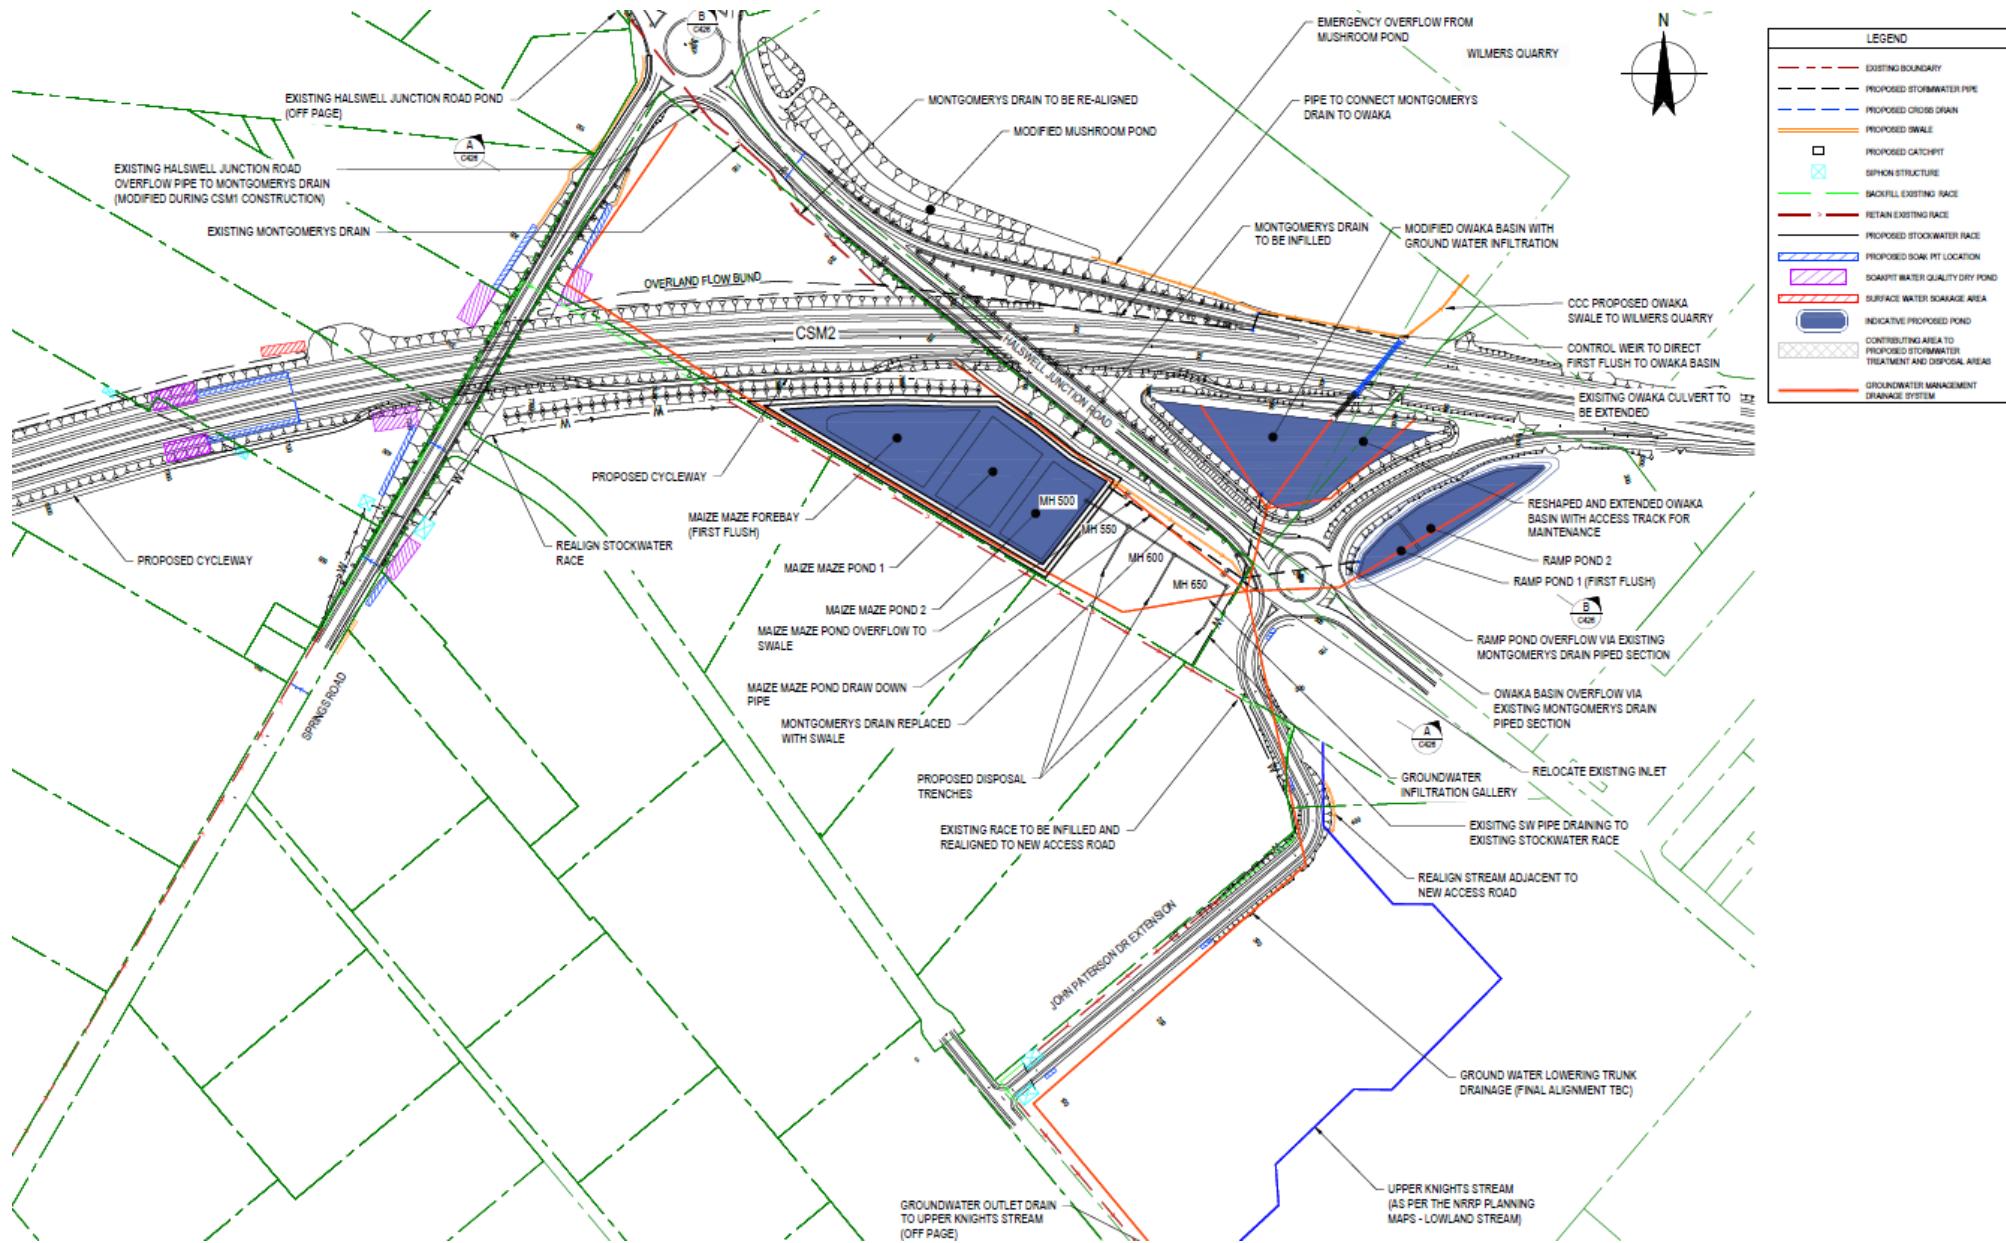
Showing Layout of Halswell Junction Road, Maize Maze Ponds and under drainage system
